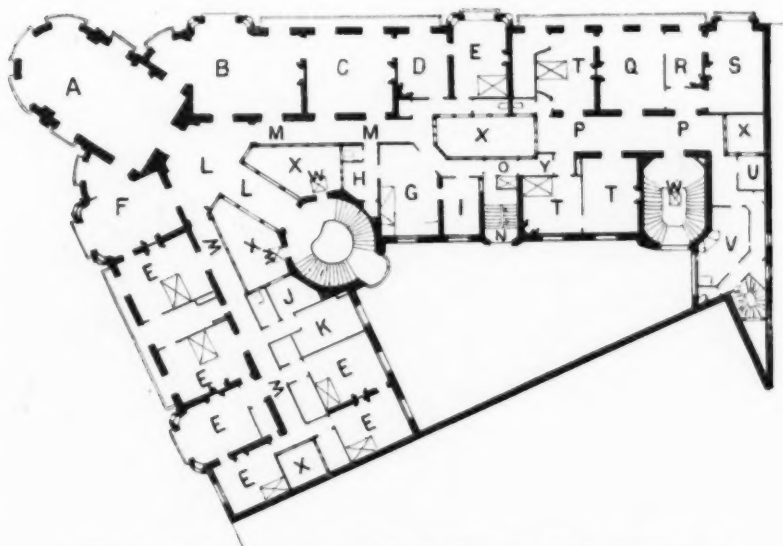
PLAN OF APARTMENT HOUSE ON THE CORNER OF CHAMPS ELYSÉES AND RUE DE BERRI.
